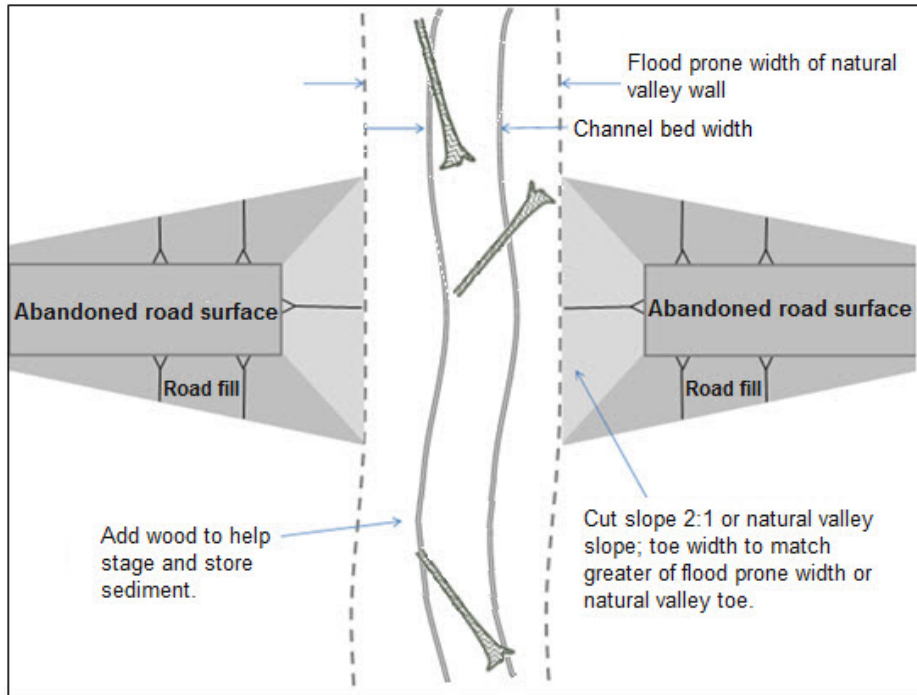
Plan view of road crossing abandonment showing excavation of road fill and placement of large wood when it is available on site and non-merchantable
